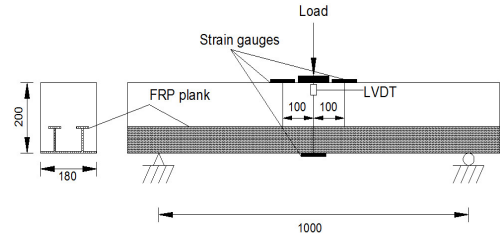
Dimension and typical instrumentation of specimens (mm)
